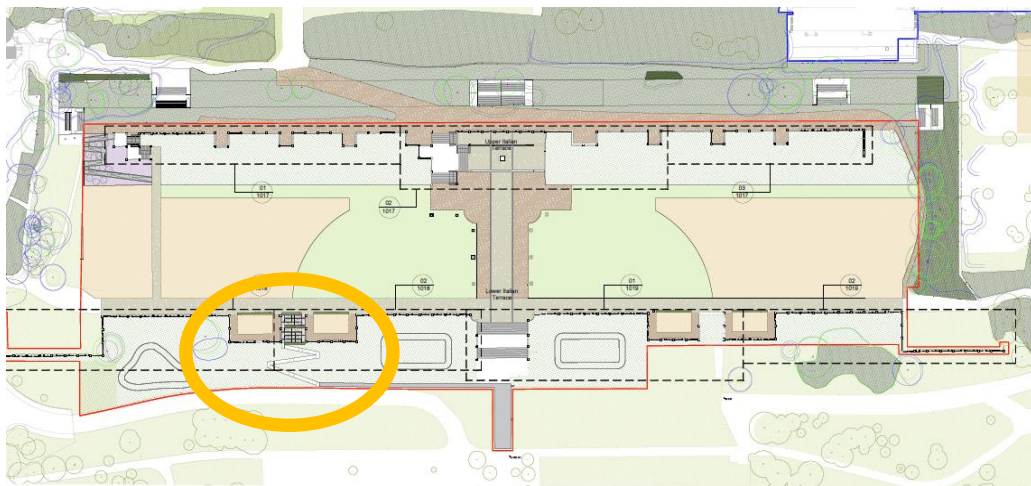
Site B – proposed Upper Italian sloped access route and lower Italian step-free ramp
